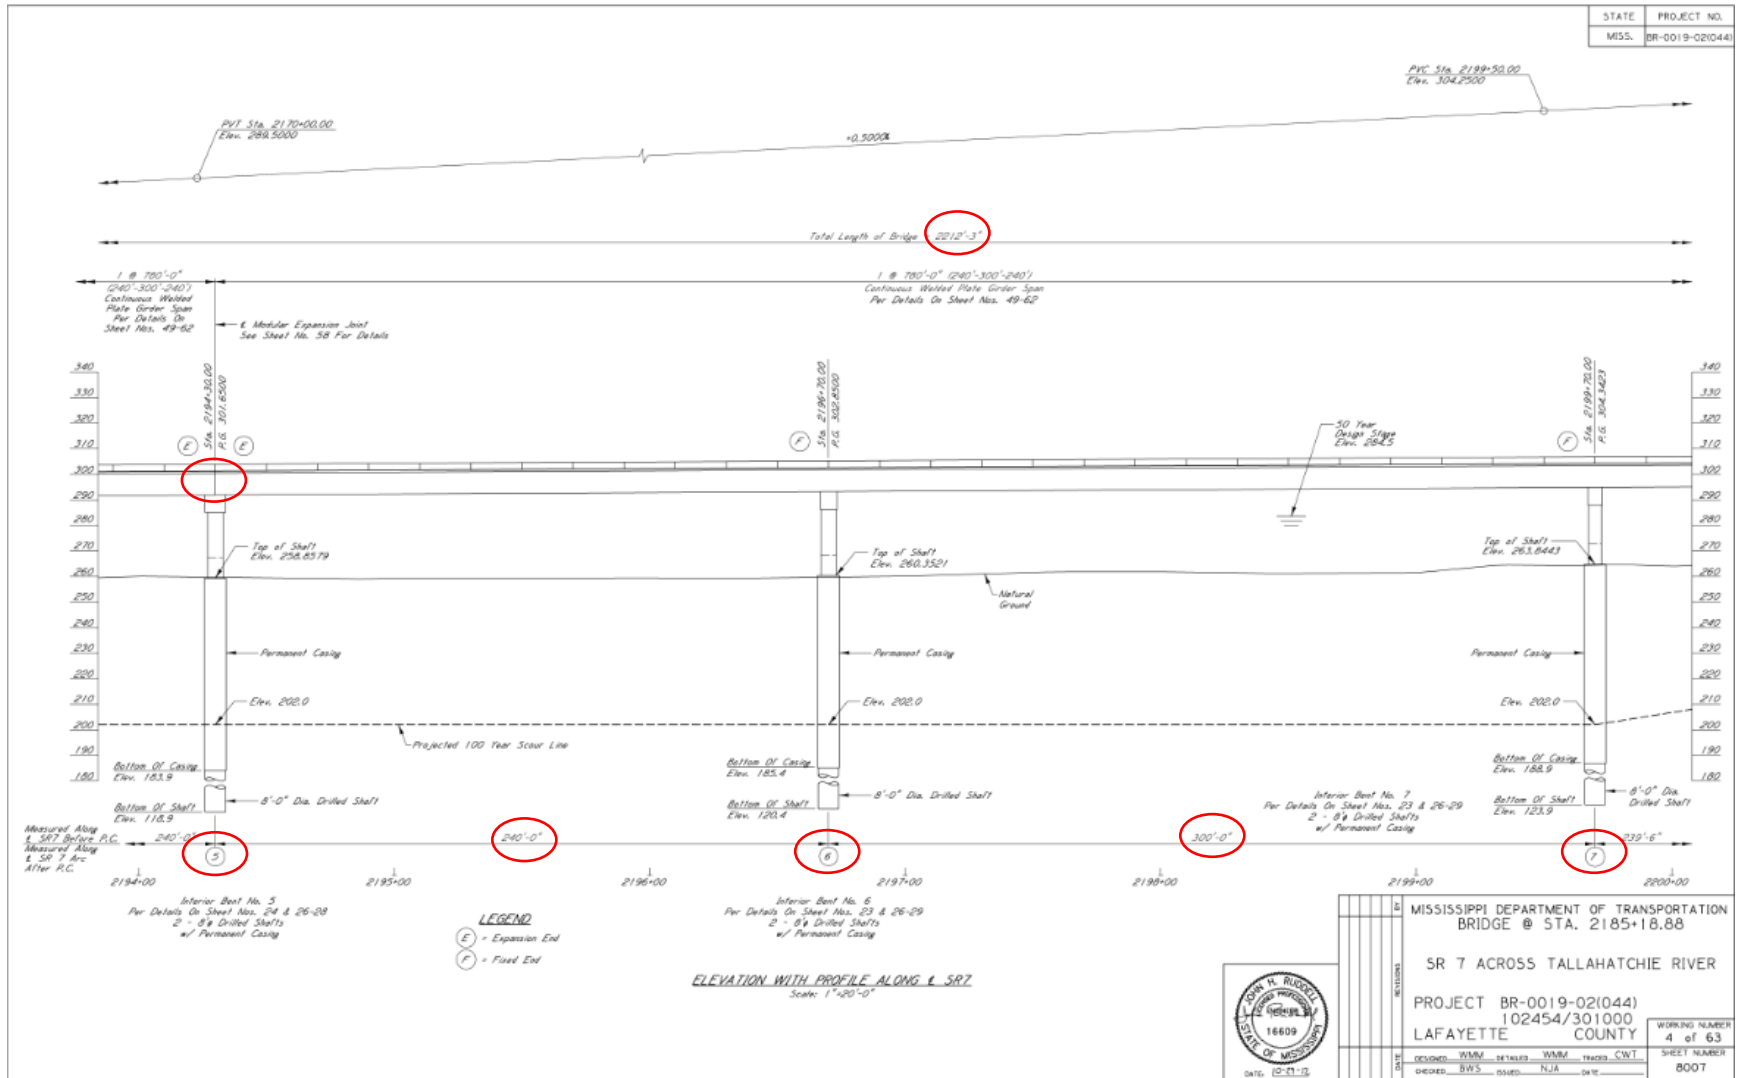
Beginning of 780 ft steel-girder supported over Piers 5, 6 and 7
